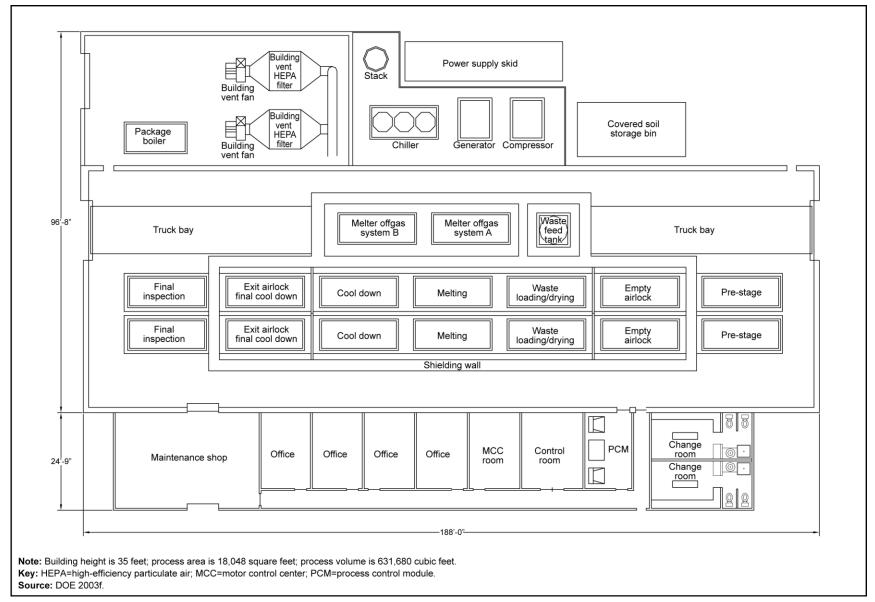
Supplemental Treatment Bulk Vitrification Facility Layout
